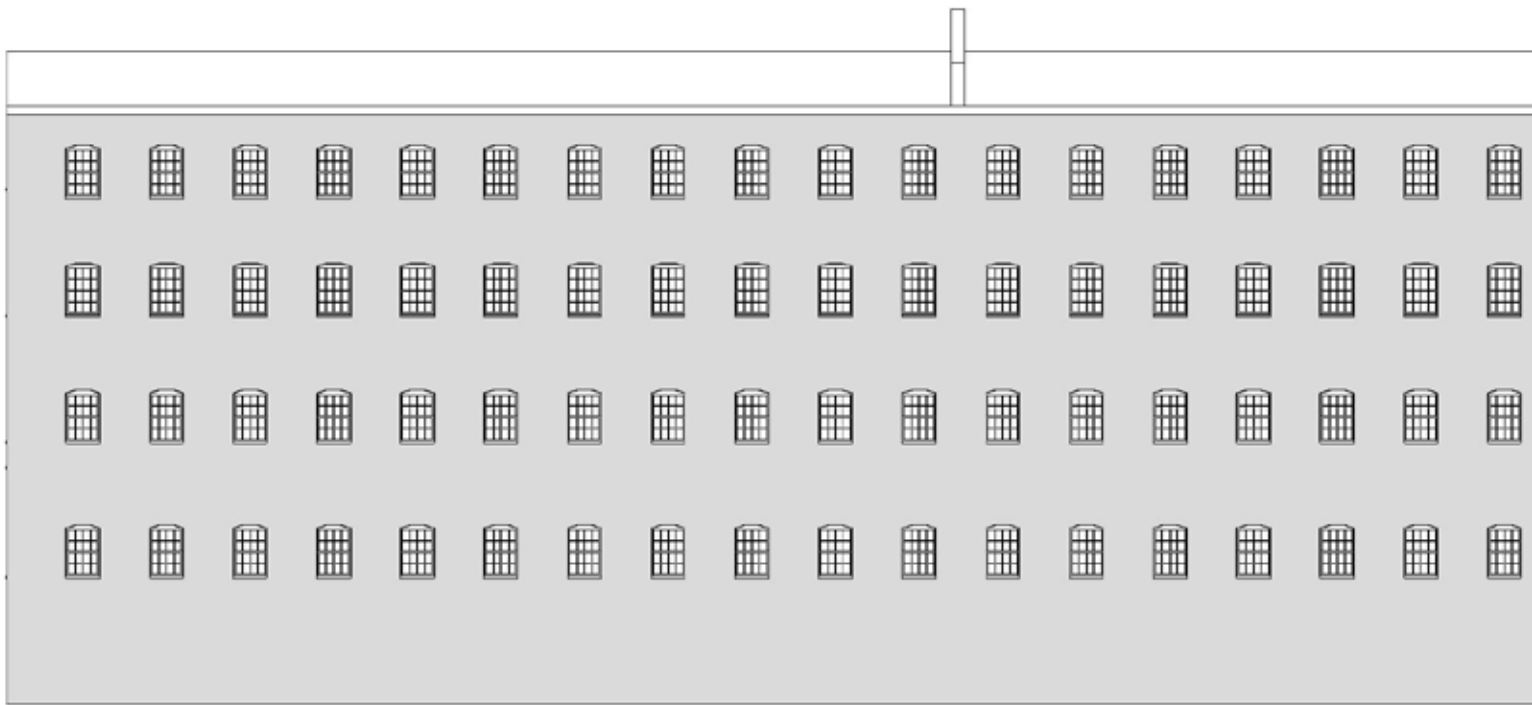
104 Anawan South Facade (Source: Morgan Warner)
